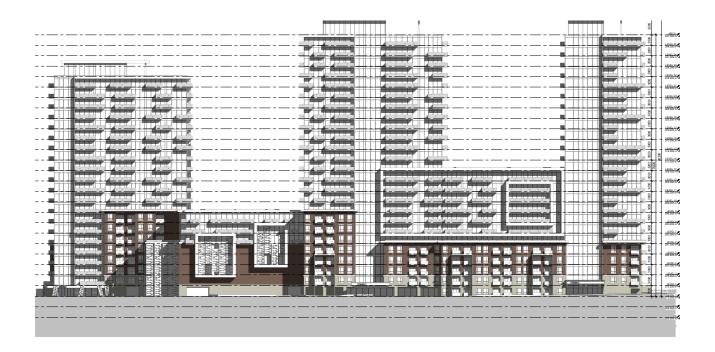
South Elevation, Building 1, prepared by SRM Architects.
